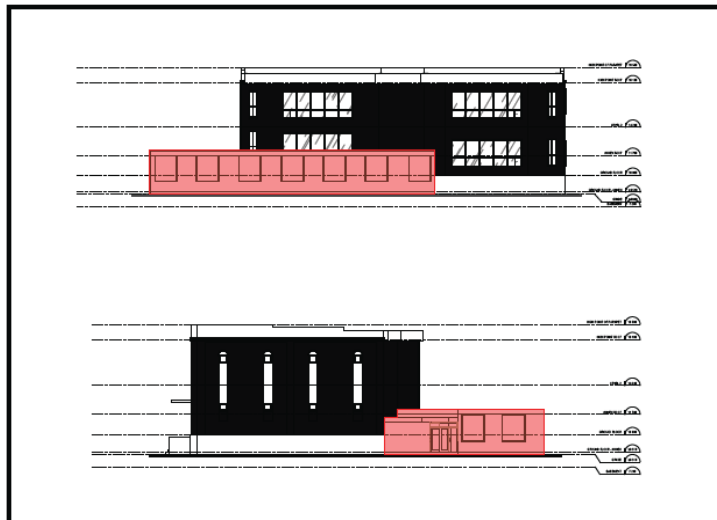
Northwest and southeast elevations of proposed demolition. EVOQ.
